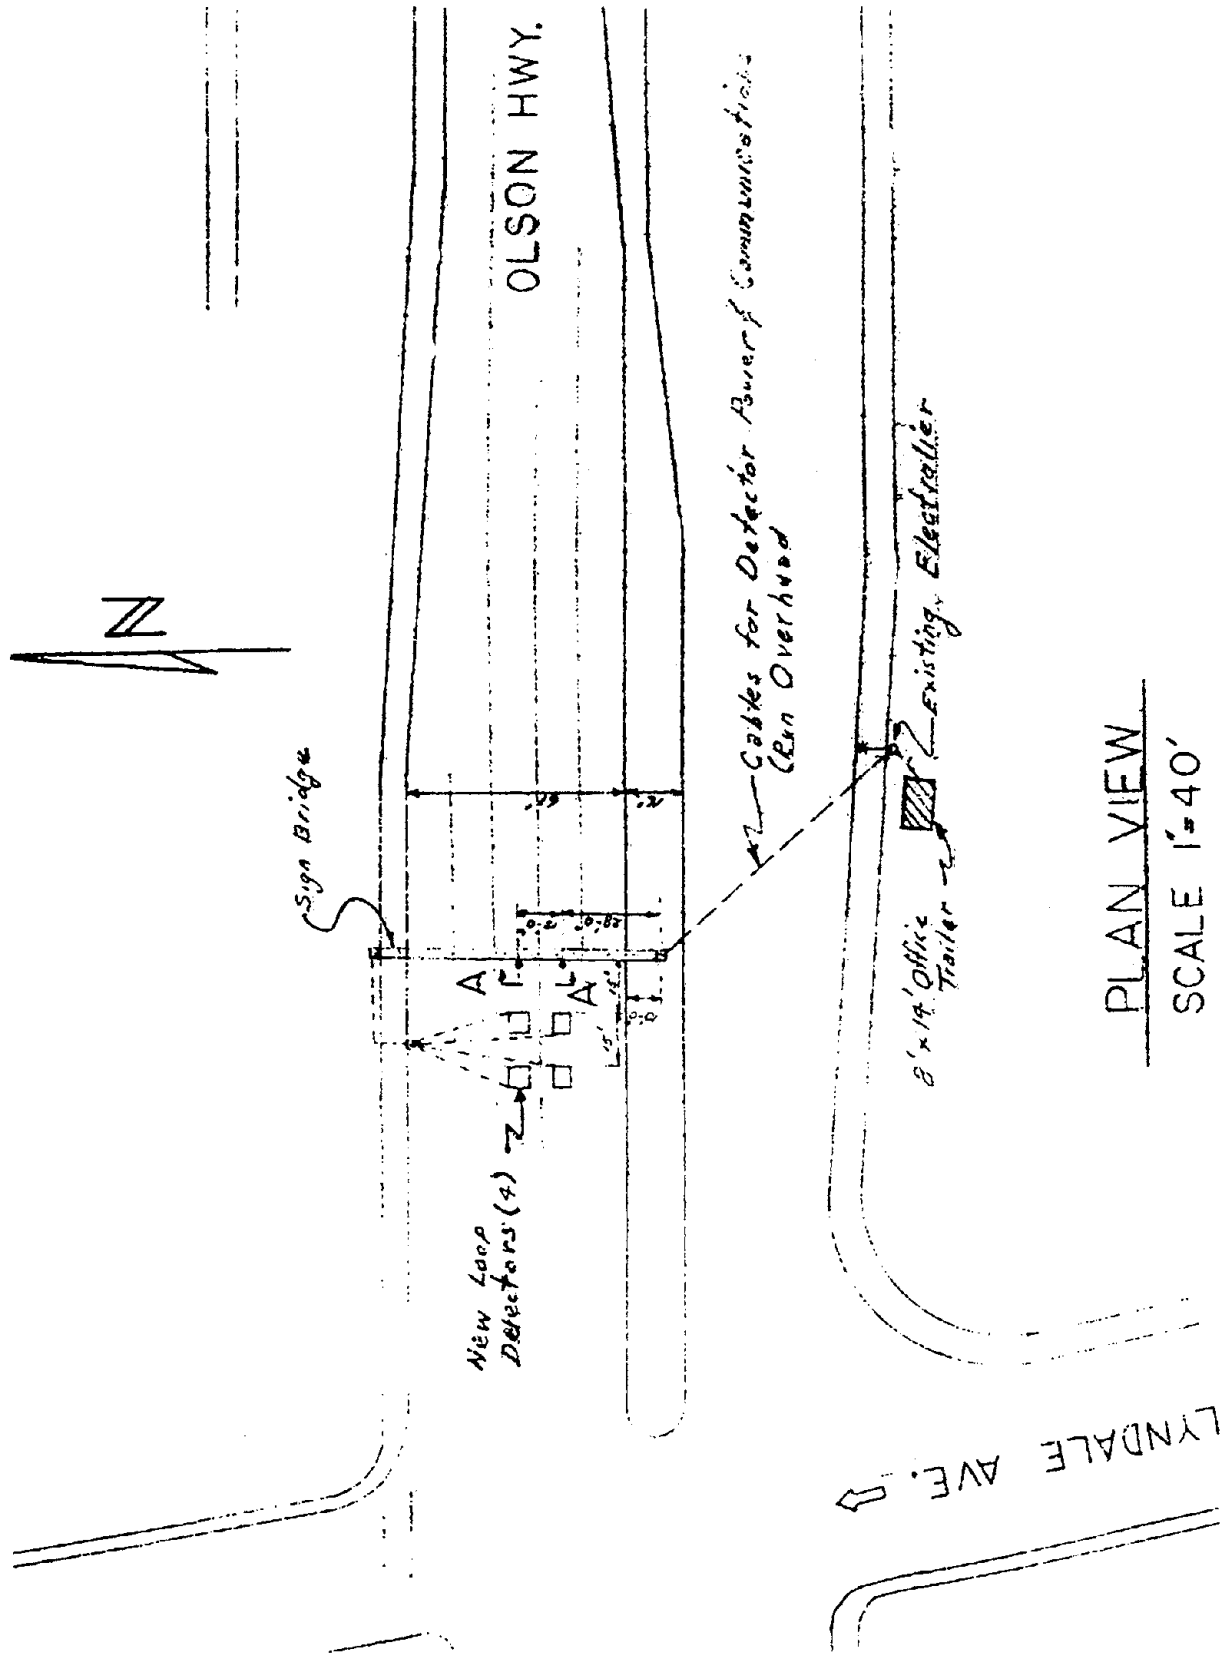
Plan View of Olson Highway and Lyndale Avenue North Site
